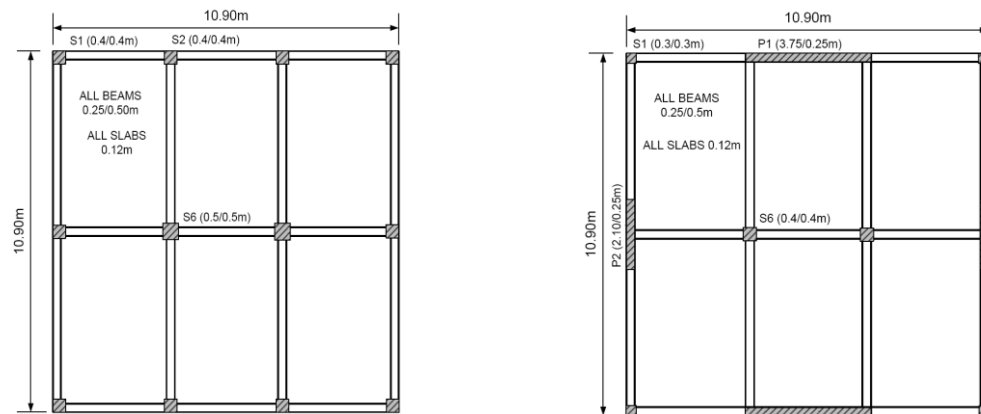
First floor plans of generic 6 storey reinforced concrete frame and dual system buildings
